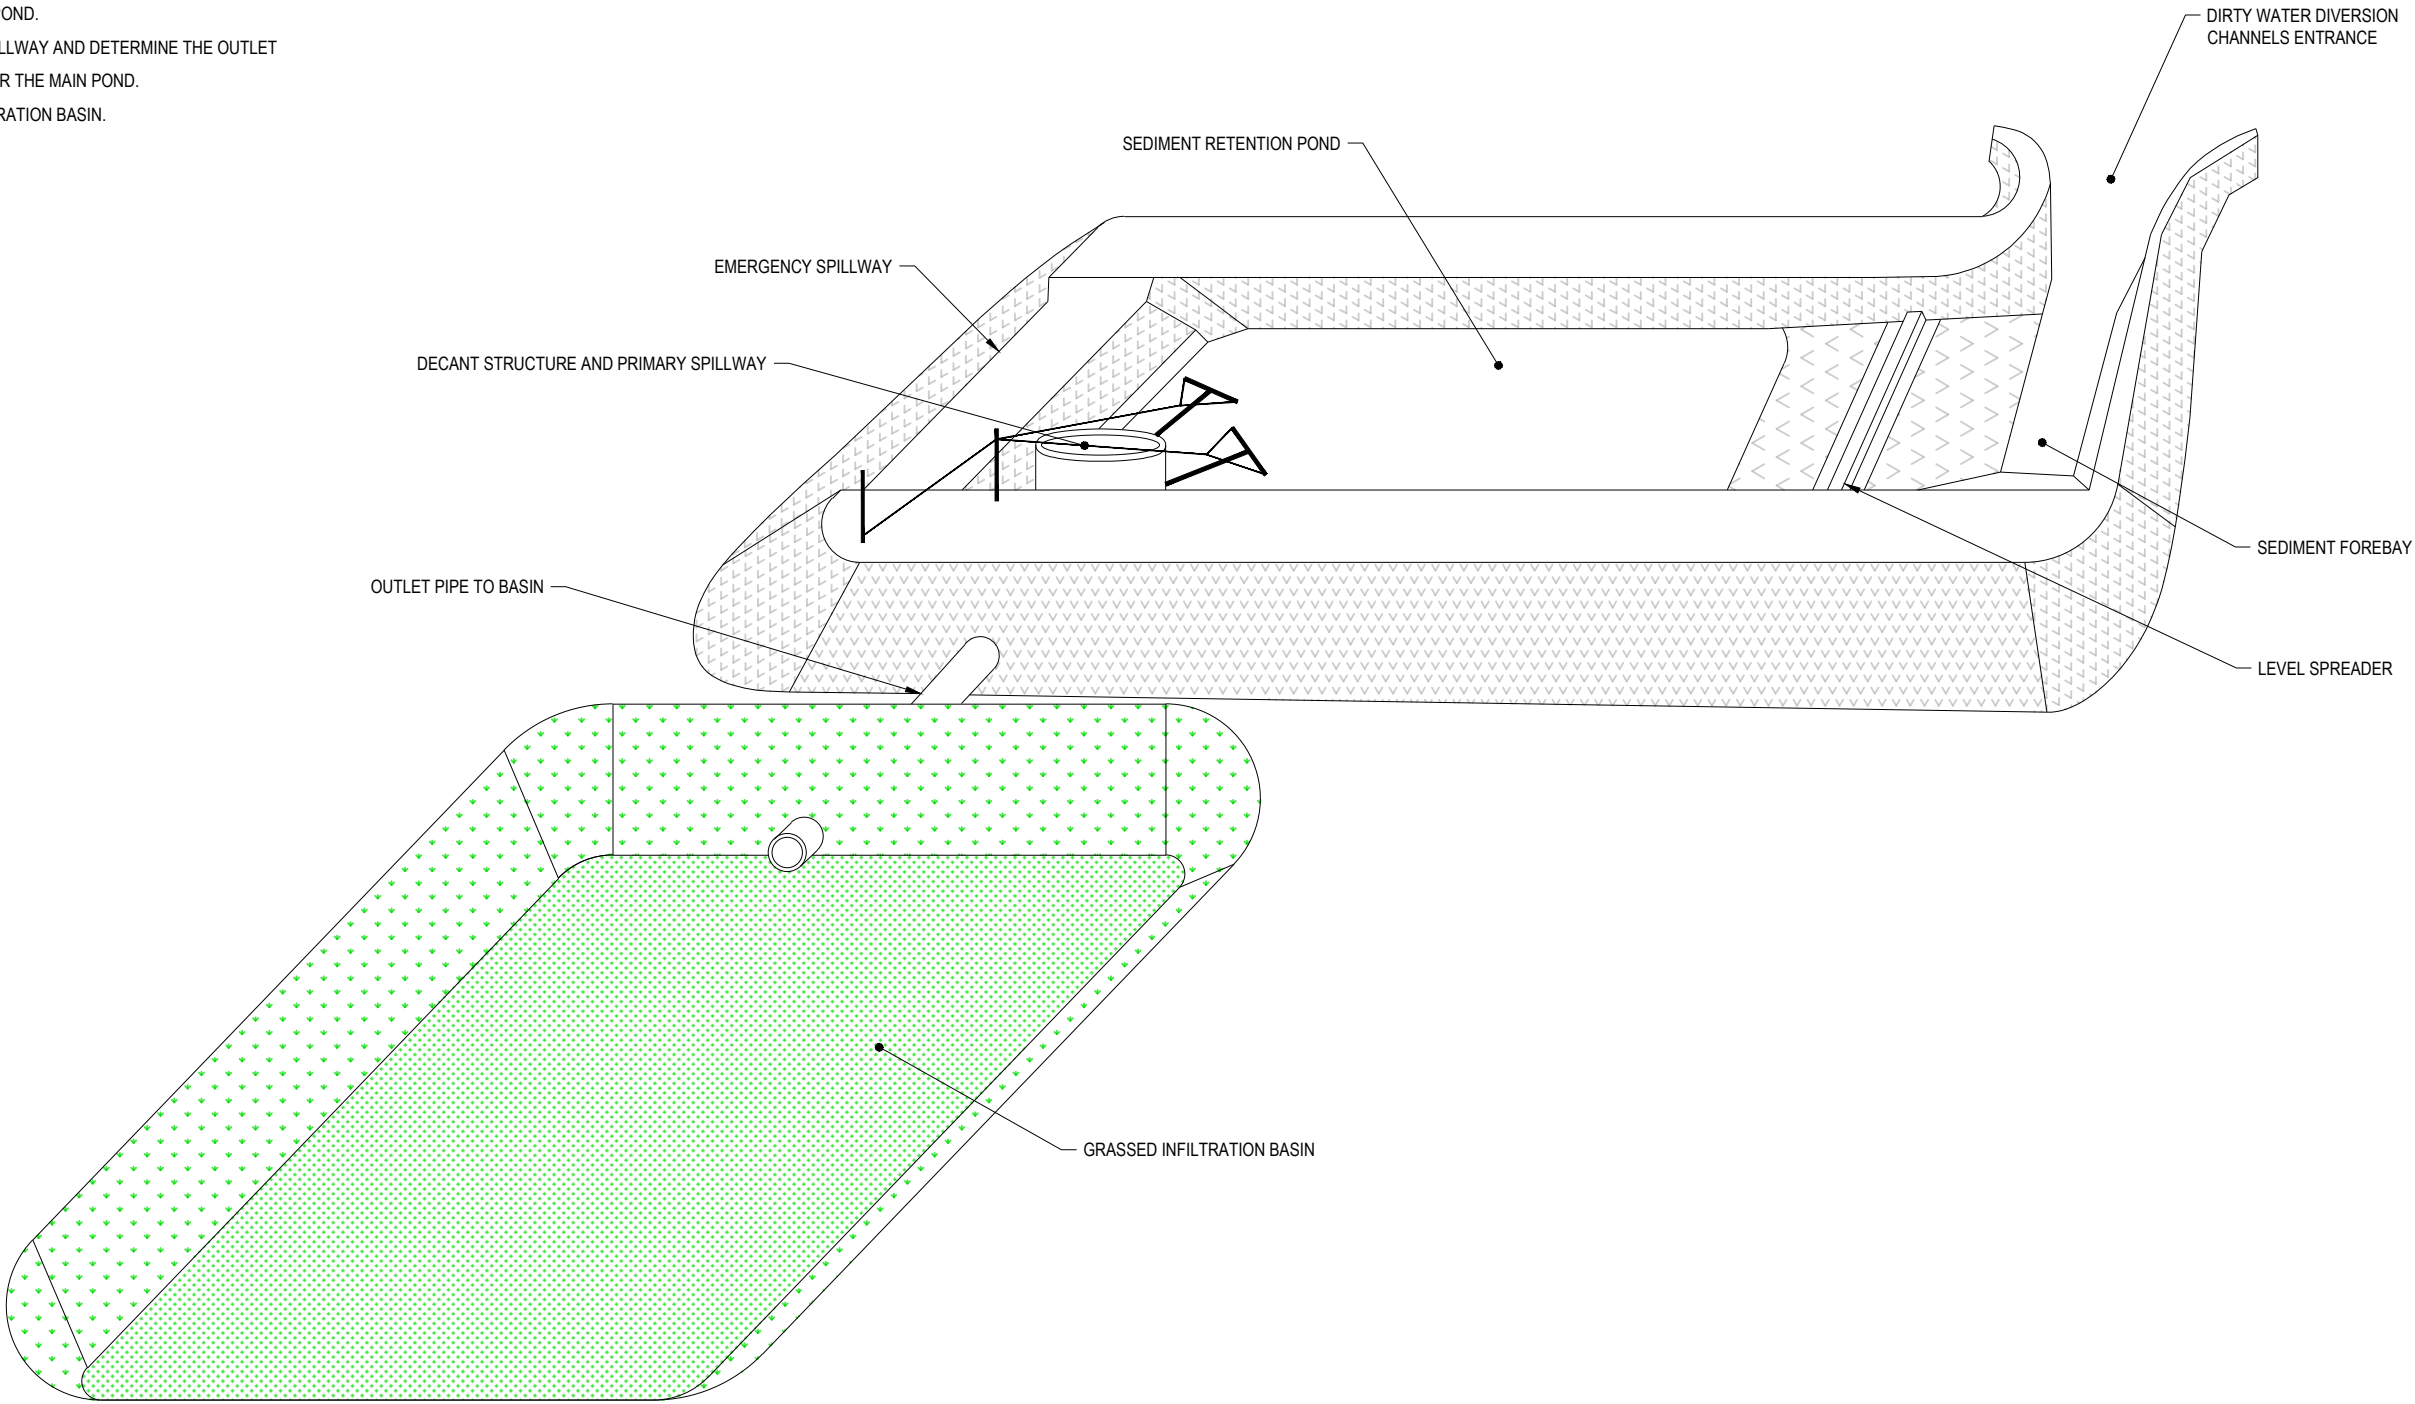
SCHEMATIC OF TYPICAL SEDIMENT RETENTION POND AND INFILTRATION BASIN
